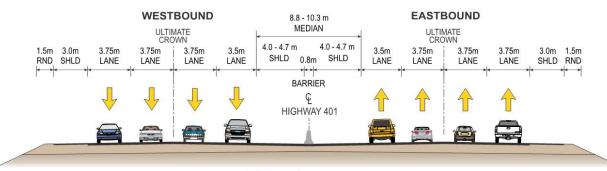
Highway 401 Section 3, Existing and Proposed Cross-Sections
